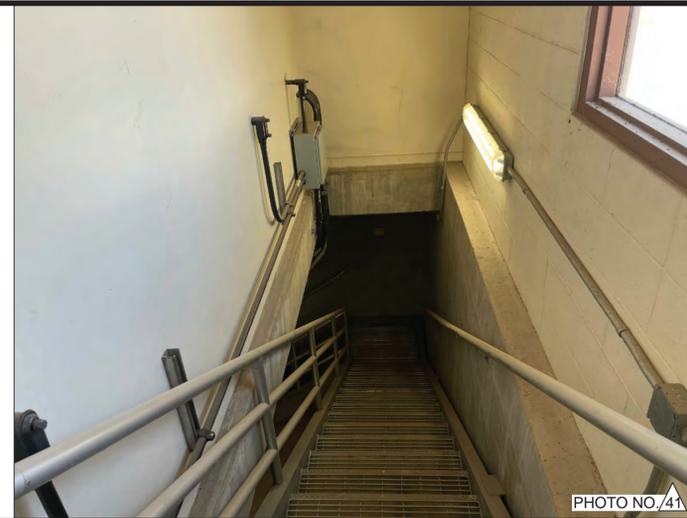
PHOTO OF THE STAIRS OF EXISTING SLUDGE PUMP STATION UPPER FLOOR
